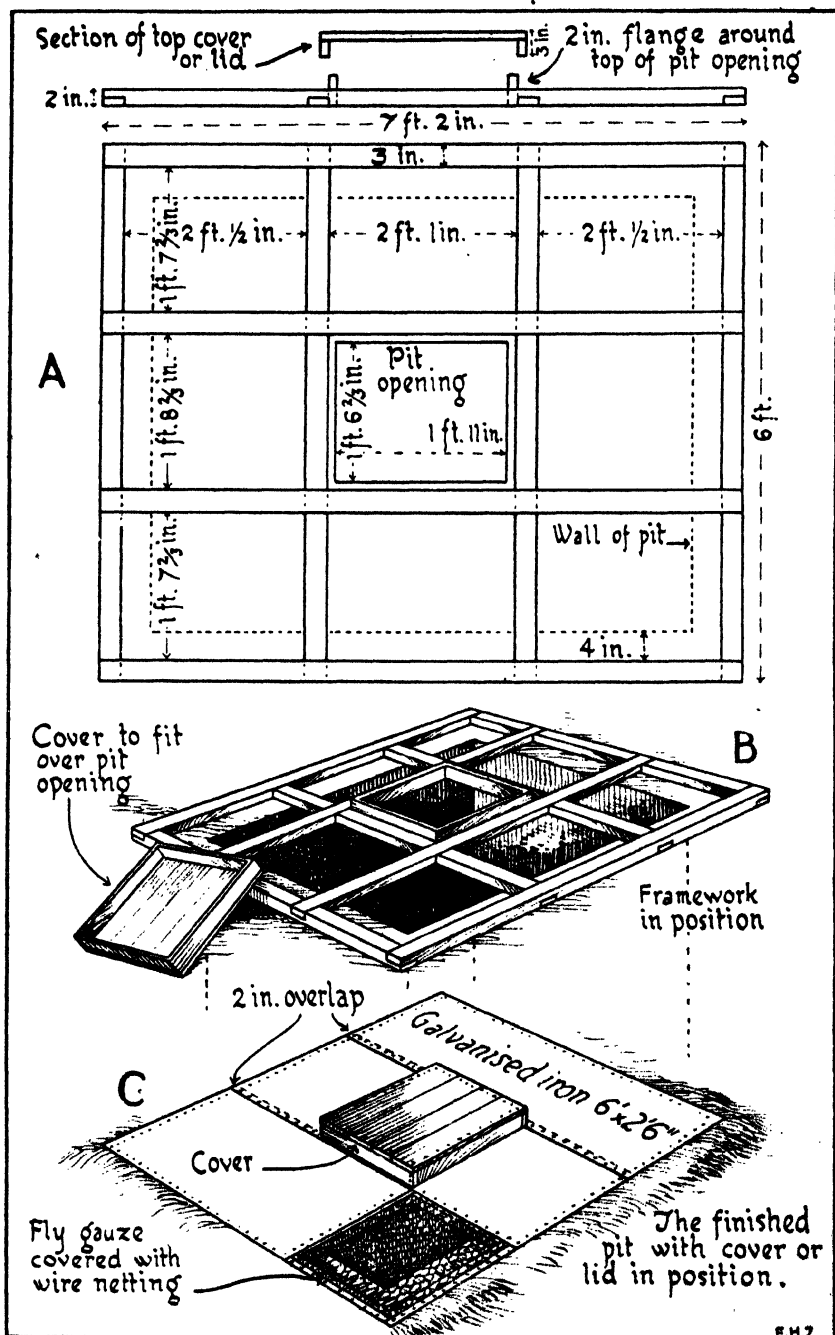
Plan of Movable Insect-proof Cover of Pit for Waste and Fly-infested Fruit.
